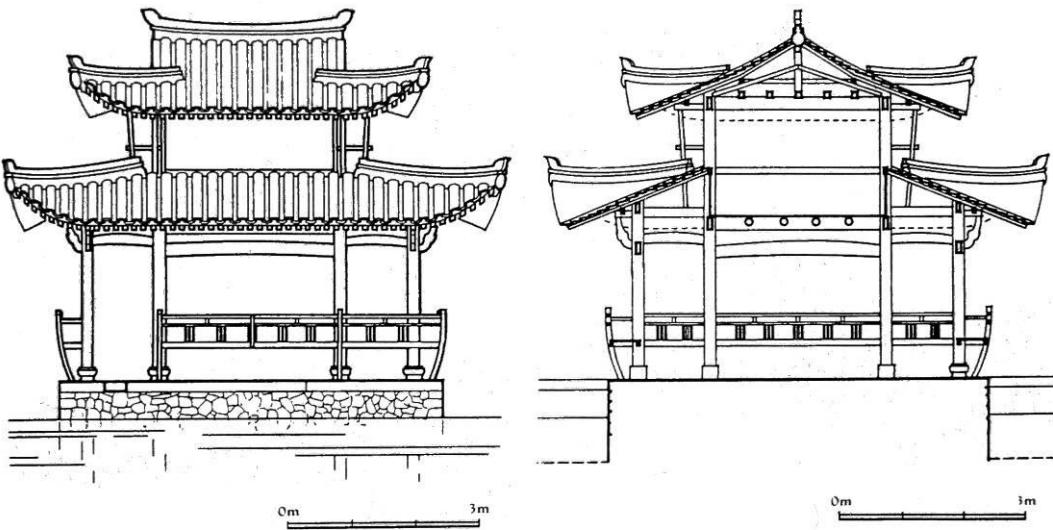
Northern Elevation (left) and Cross Section (right) of the Furong Pavilion
